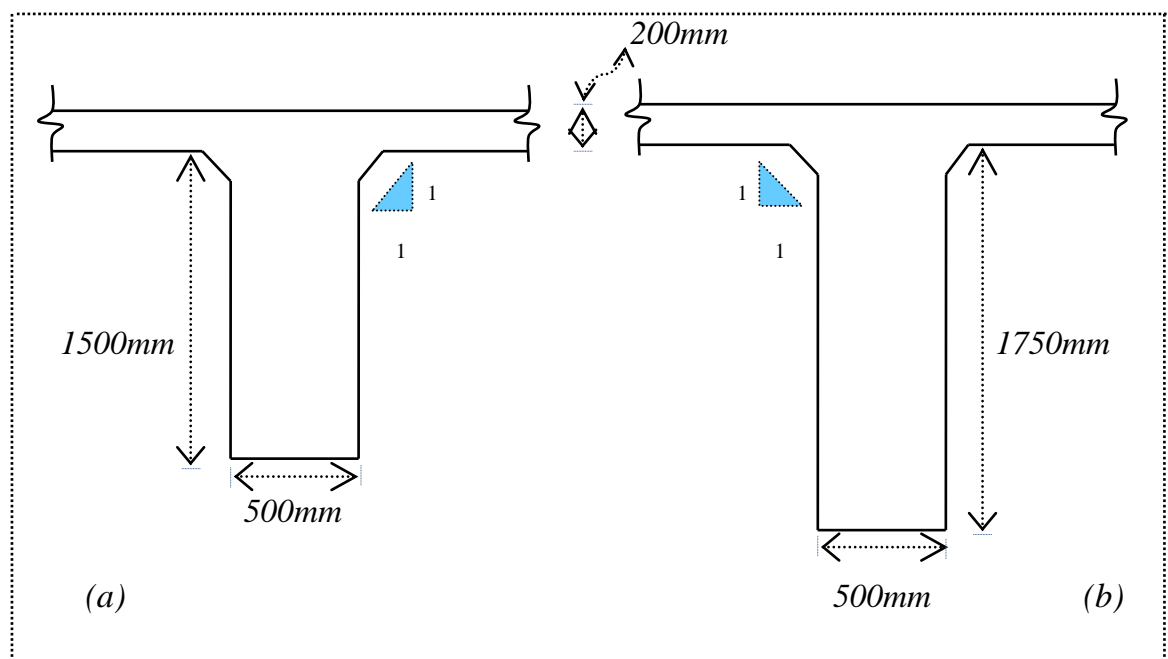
Dimensions of Cast in situ Continuous Concrete Girder for (a) Bridge-1 and (b) Bridge-2
